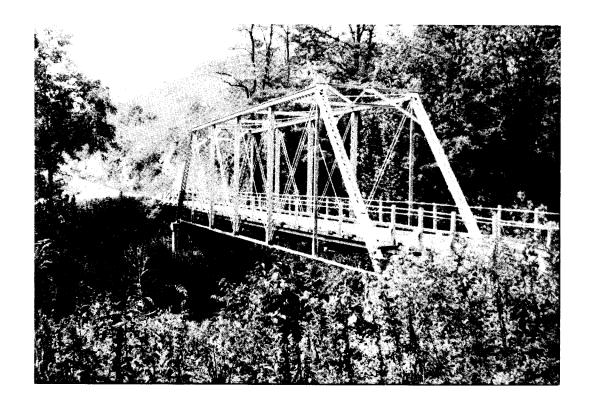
A single-span Pratt through truss built by the Penn Bridge Company of Beaver Falls, Pa.
